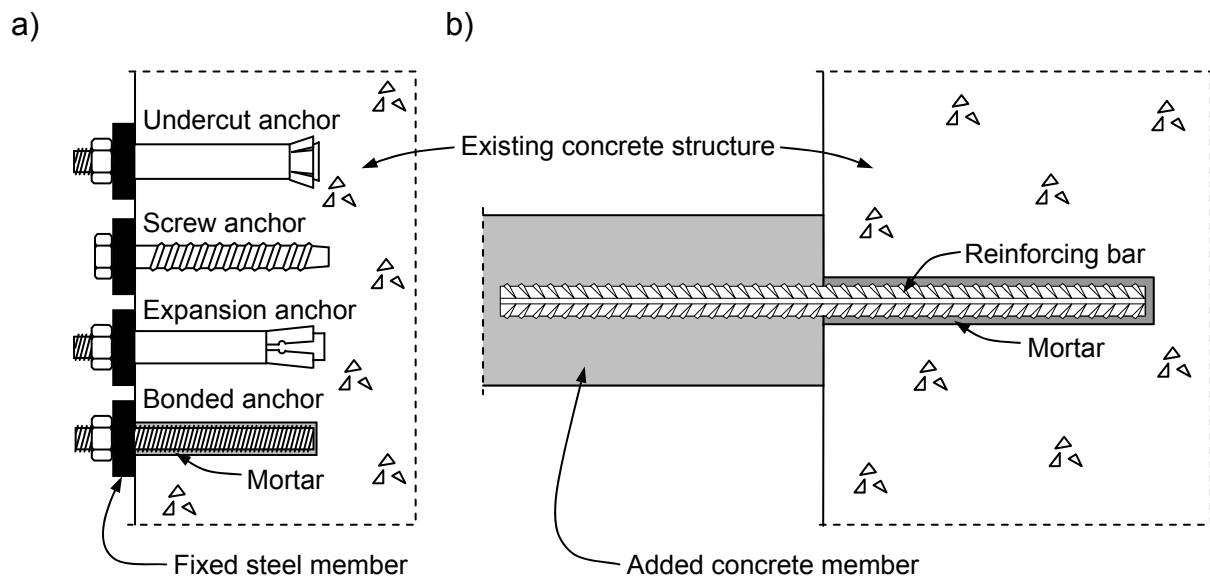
Schematic of a) various post-installed anchors and b) post-installed reinforcing bar to connect existing and retrofitting structural elements
